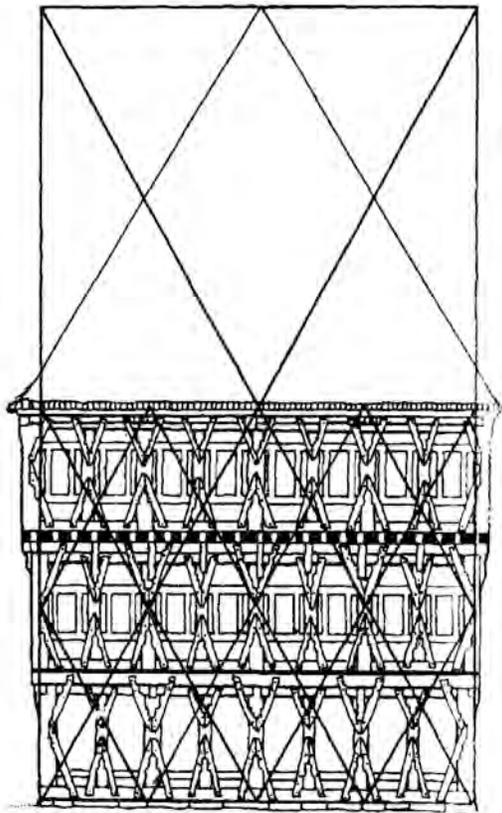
Illustration B of geometrical building set out at Ty-Mawr ²⁶
